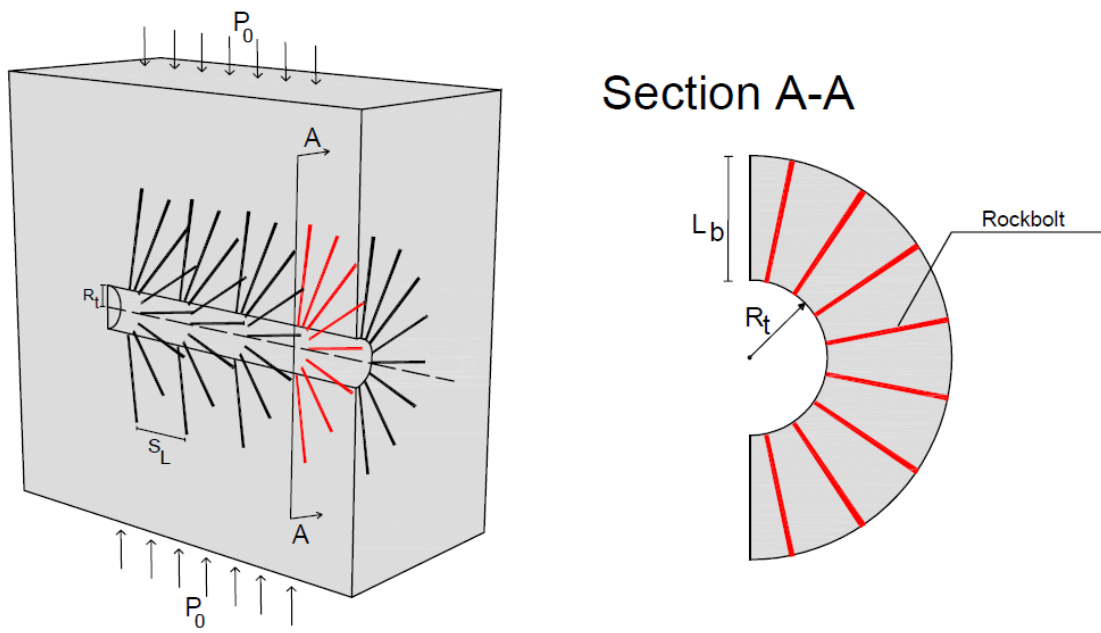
3D view of the systematic rockbolt reinforcement around the tunnel
